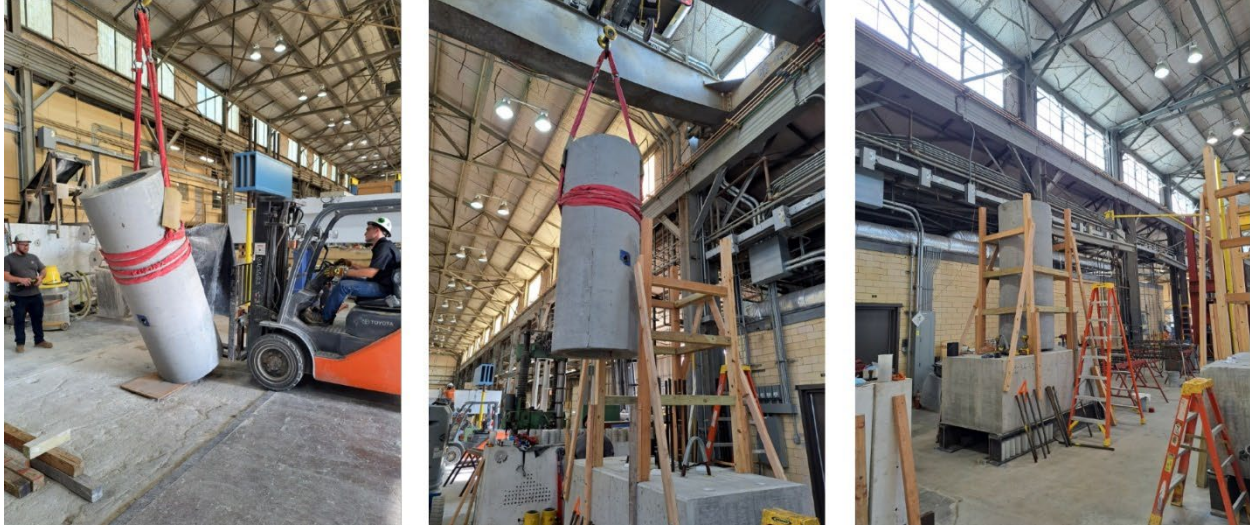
Lifting and placing of Precast Column for Specimen S4-R-Tx-34.
